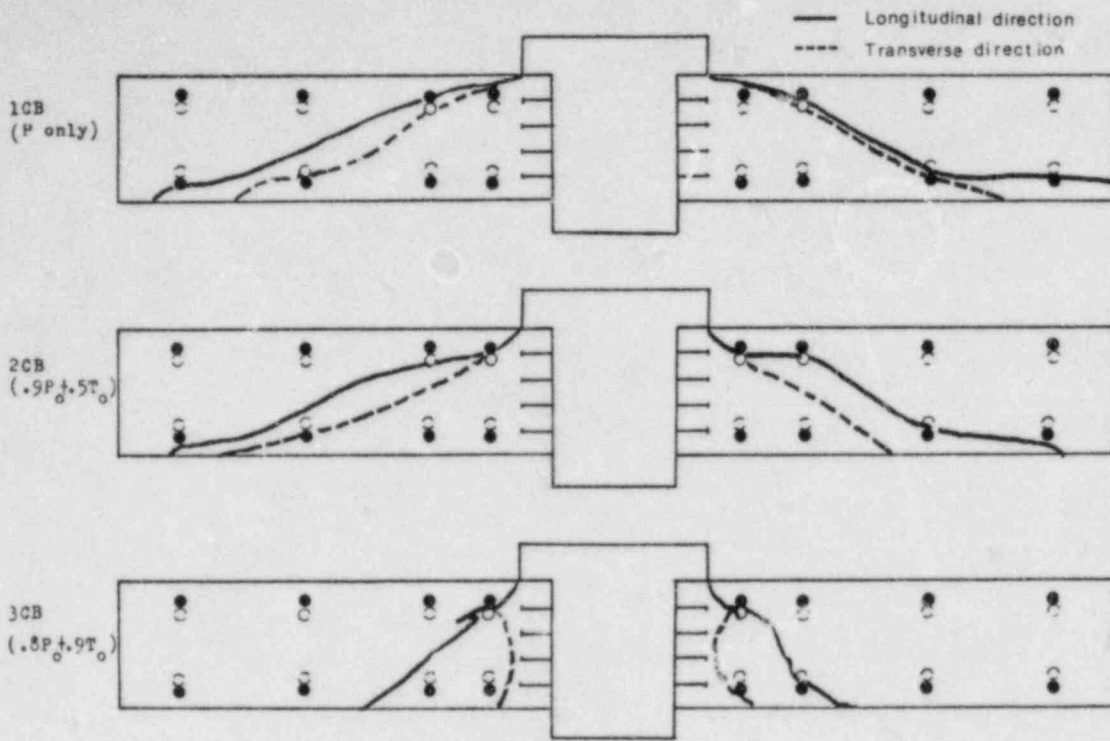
Failure Surfaces for 1.0 in. Penetration Specimens Under Varying P + T
